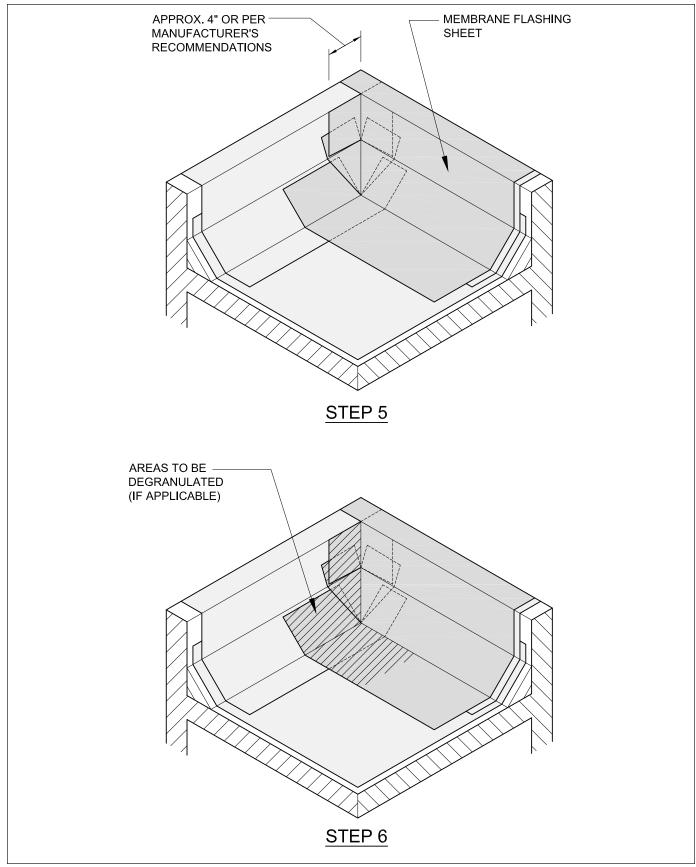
BUR and polymer-modified bitumen roof membrane inside corner flashing application (continued)
